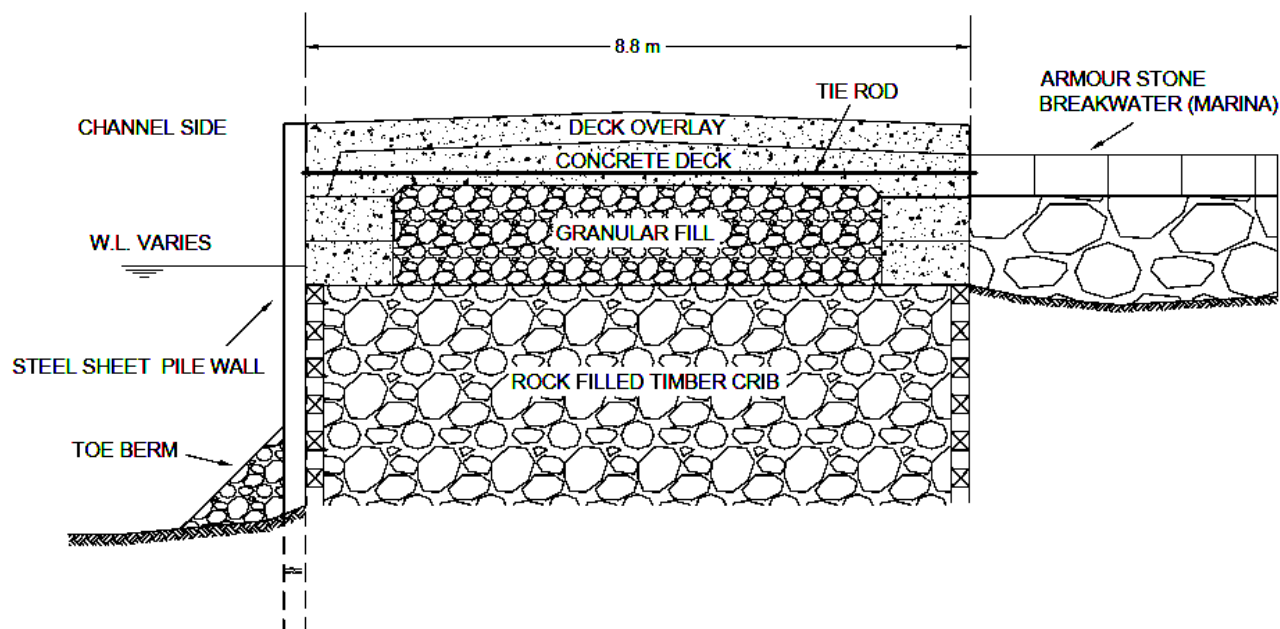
Typical Pier where Augmented with Steel Sheet Piling
